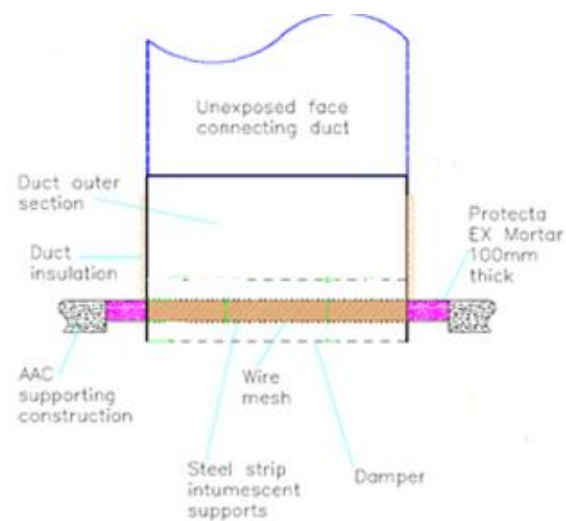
Typical installation of Protecta FR Damper in concrete floor
